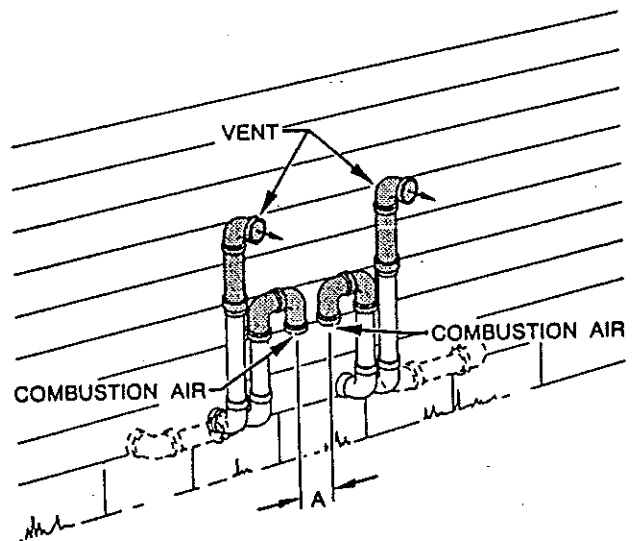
Sidewall Termination (12 in. or less) (Dimension A as touching or 2-in. maximum separation)
